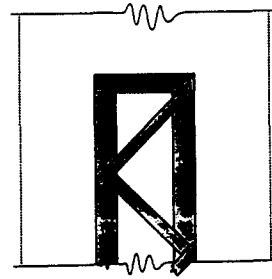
Steel core in concrete column whose rigidity produces a concentration of stress over the top of the core.
